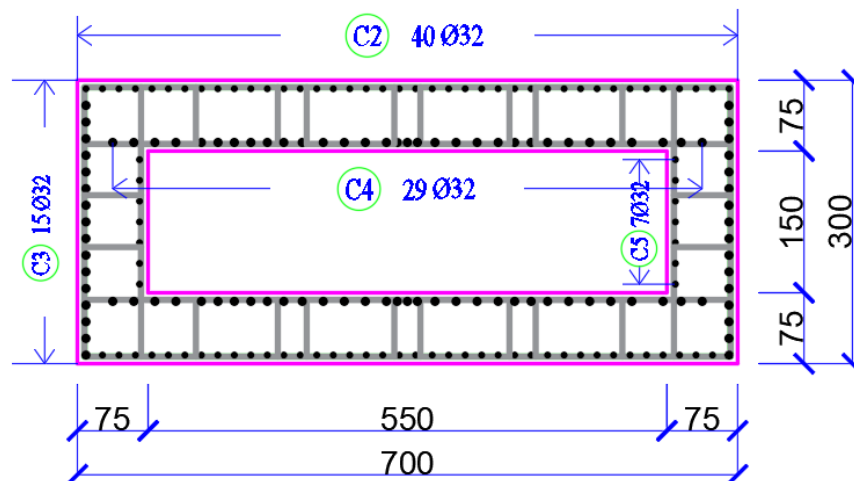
General Reinforcement Layout Type I (North Viaduct Axis 3)
